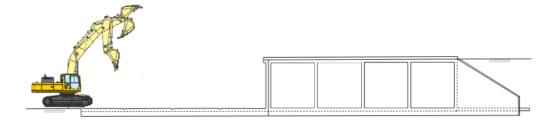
Demolition Stage 3 Segment 1 completed (Source: FBE)
